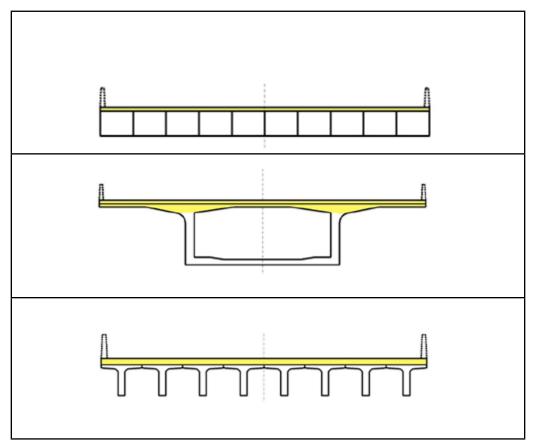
Prestressed Concrete Deck (Highlighted)
